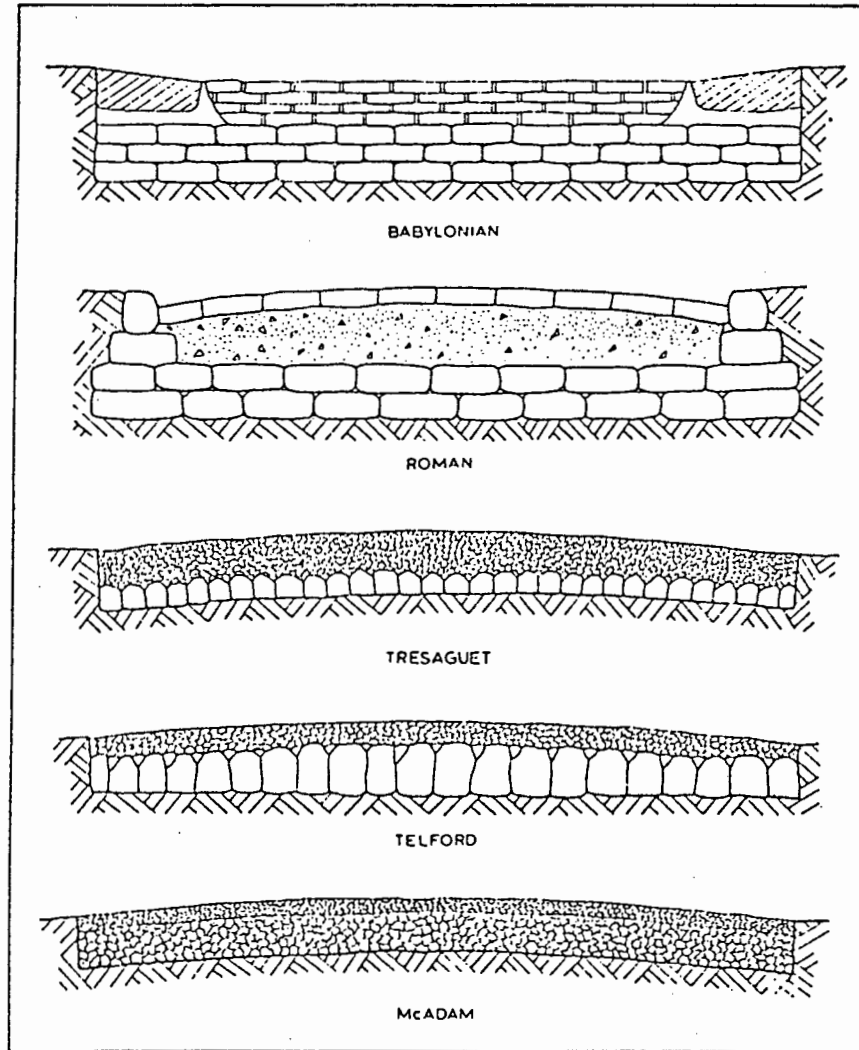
ROAD CROSS-SECTIONS SHOWING DEVELOPEMENT OF CONSTRUCTION METHODS (AFTER SCHWARTZ, 1978)
